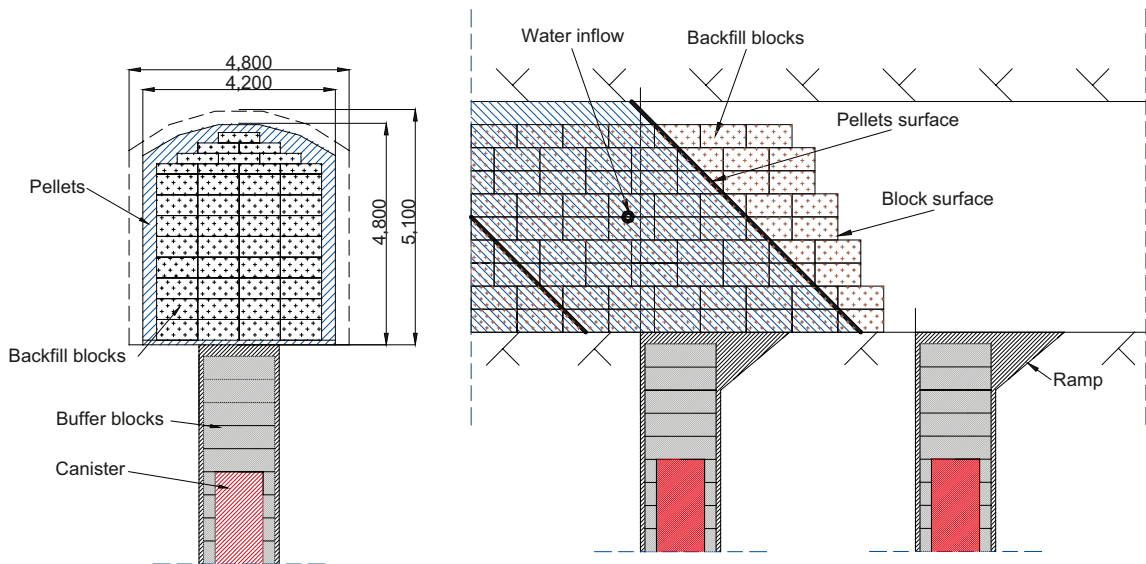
Schematic picture of the backfill system tested at Äspö. Left: Cross section of the deposition tunnel with smectite-rich clay pellets surrounding masonry of blocks of Friedland clay. Right: Longitudinal section showing sloping pellet fill on both sides of the masonry.
